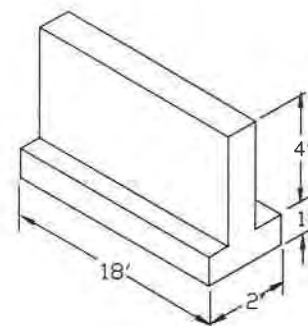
DETAIL I. CROSS-SECTION OF FOOTER & SLAB
